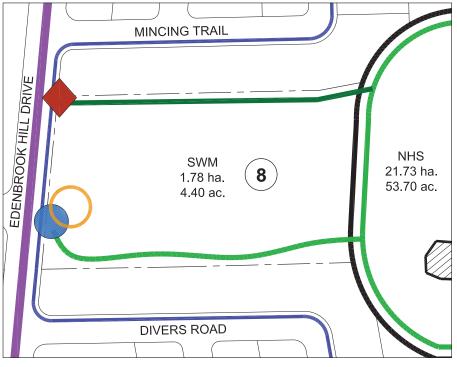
SWM Pond #8 Facility Fit.
